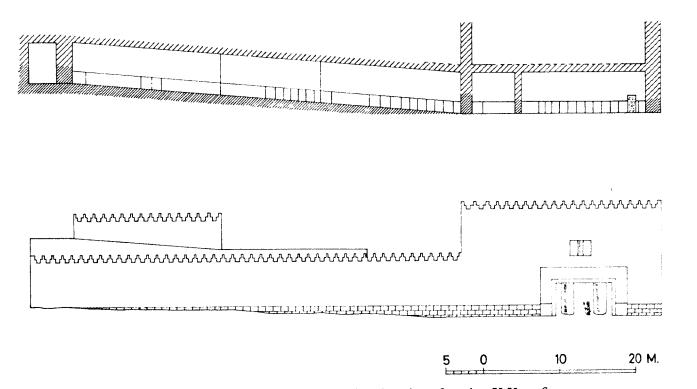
Reconstructed section and exterior elevation of section Y-Y on fig. 7
